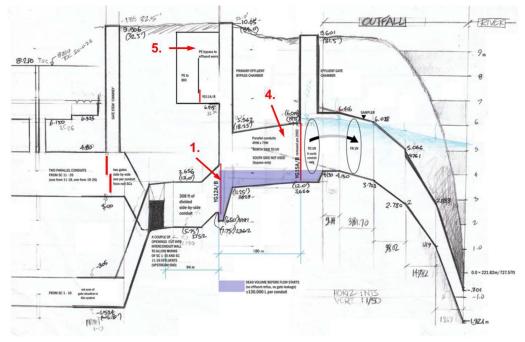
Profile through the Secondary Effluent and Outfall Conduits
